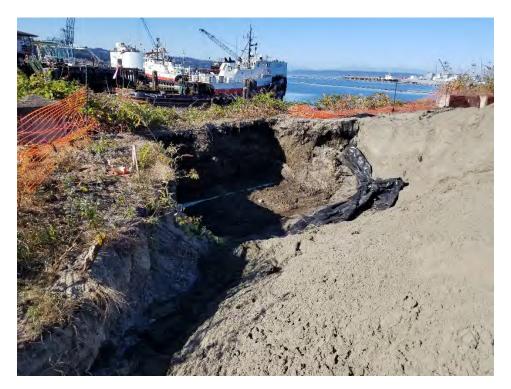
Southern sidewall showing top of shoreline bank after second overexcavation, looking west.
